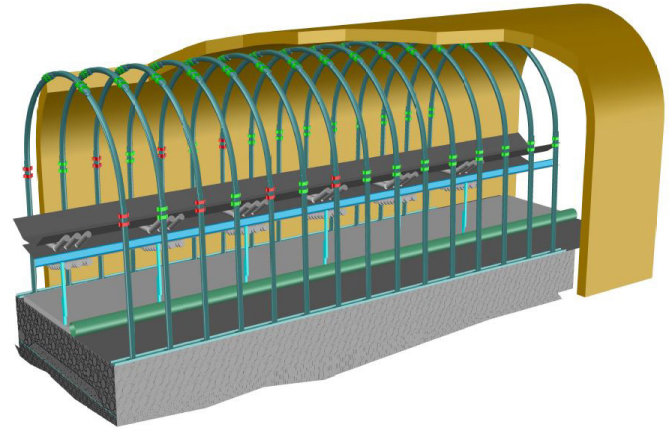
3D perspective view showing Yielding Steel Sets and Conveyor belt arrangements
